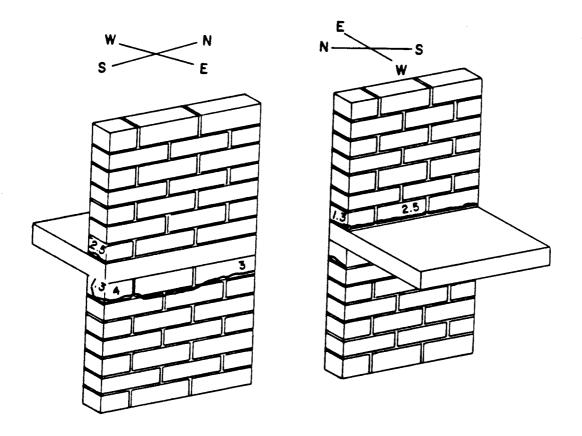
Crack Distribution at Failure on Specimen WSA100
